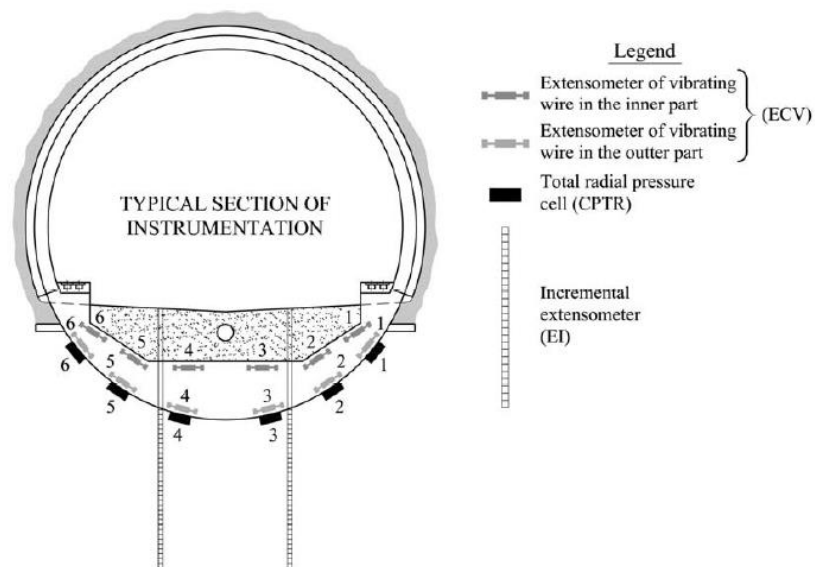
Typical instrumented section of reinforced tunnel with instruments installed only in invert (Ramon, 2014)
